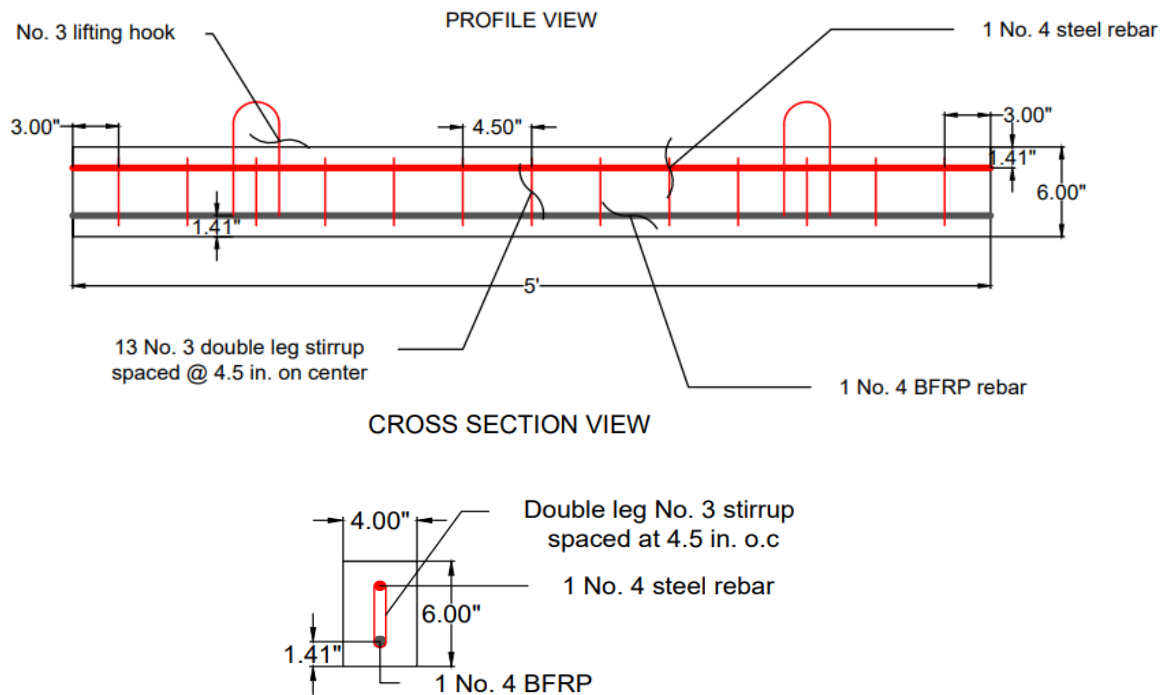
Reinforcement details for the prestressed BFRP concrete beam
